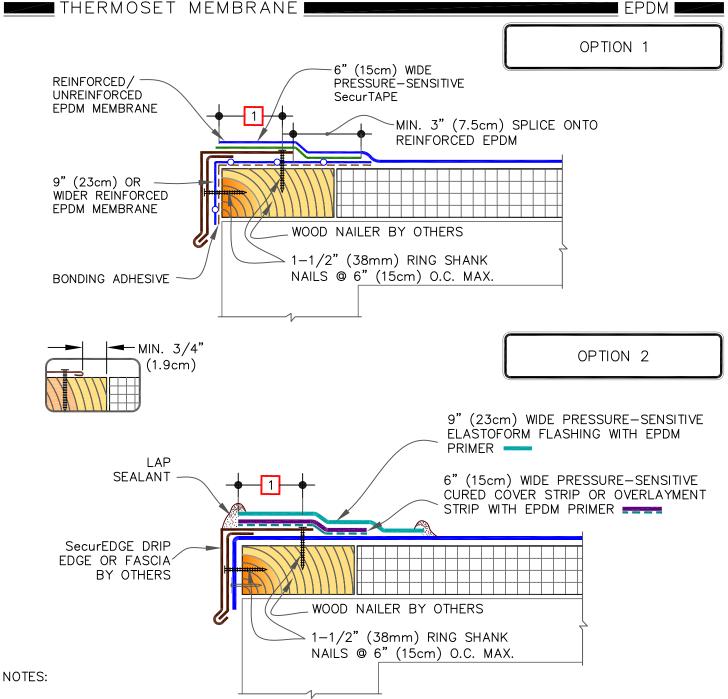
U (UNIVERSAL DETAIL)
